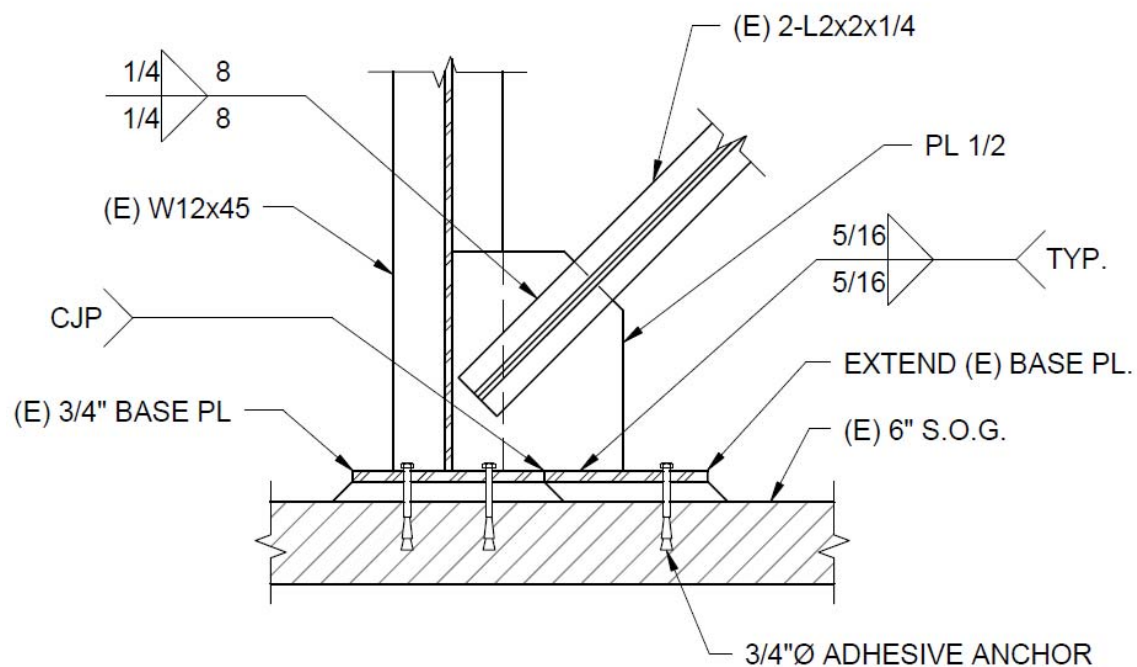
Strengthening of Tension Only Brace Connection at Column Base
